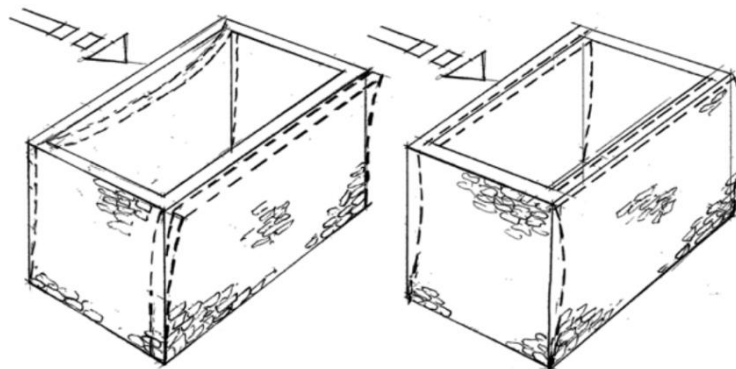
Masonry building during earthquake shaking: a) loosely connected walls without slab at the roof level, and b) a building with well connected
